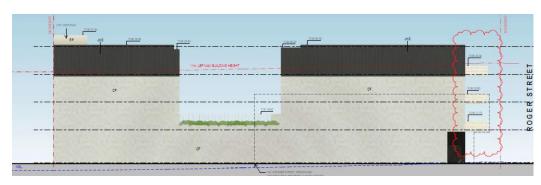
South Elevation by CD Architects with extent of height breach above red line
